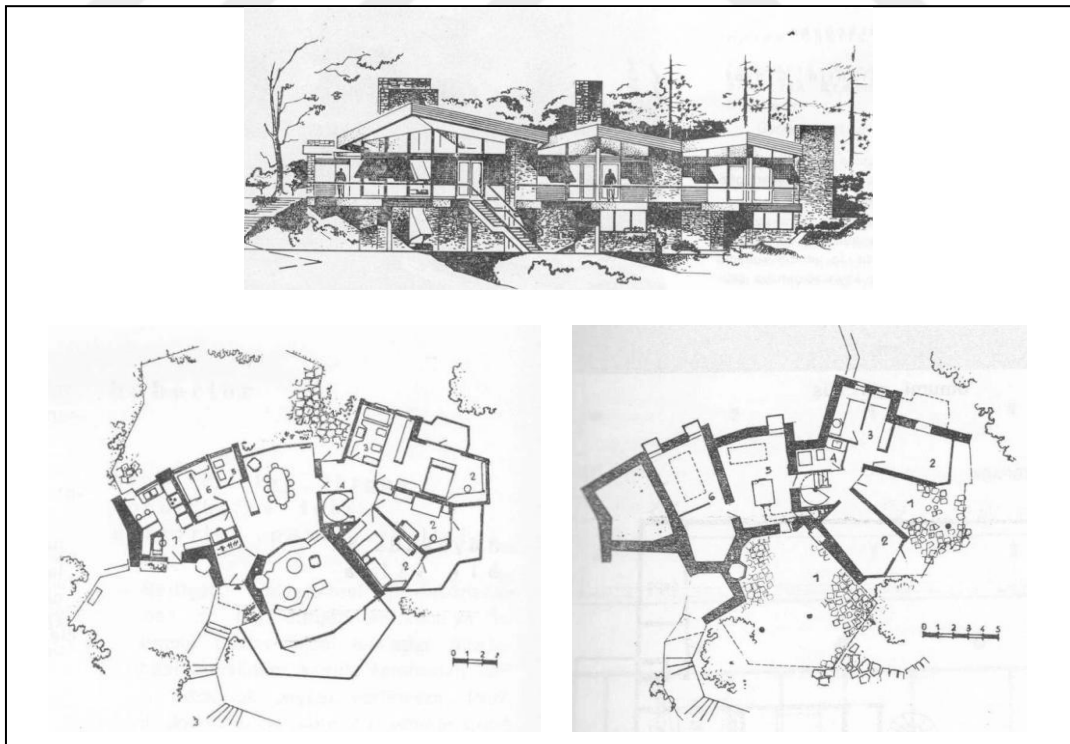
Floor plans and facade appearance of Seyhun villas [87]
